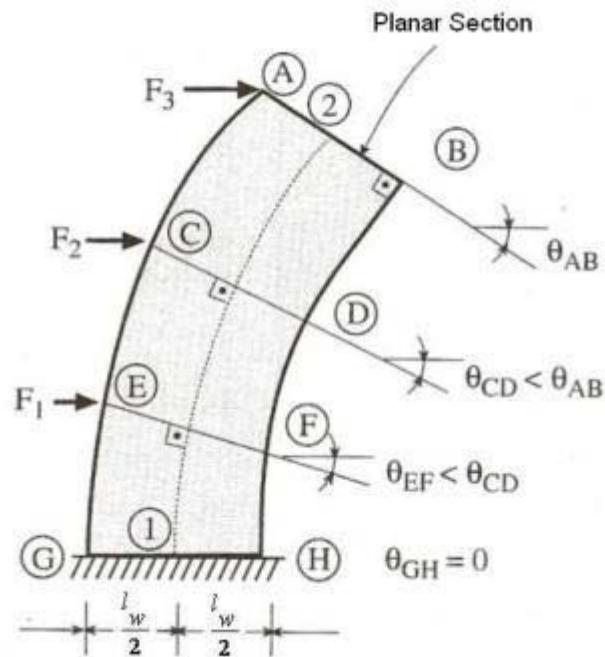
5. Deformation of Structural Wall under Lateral Loads [6]
